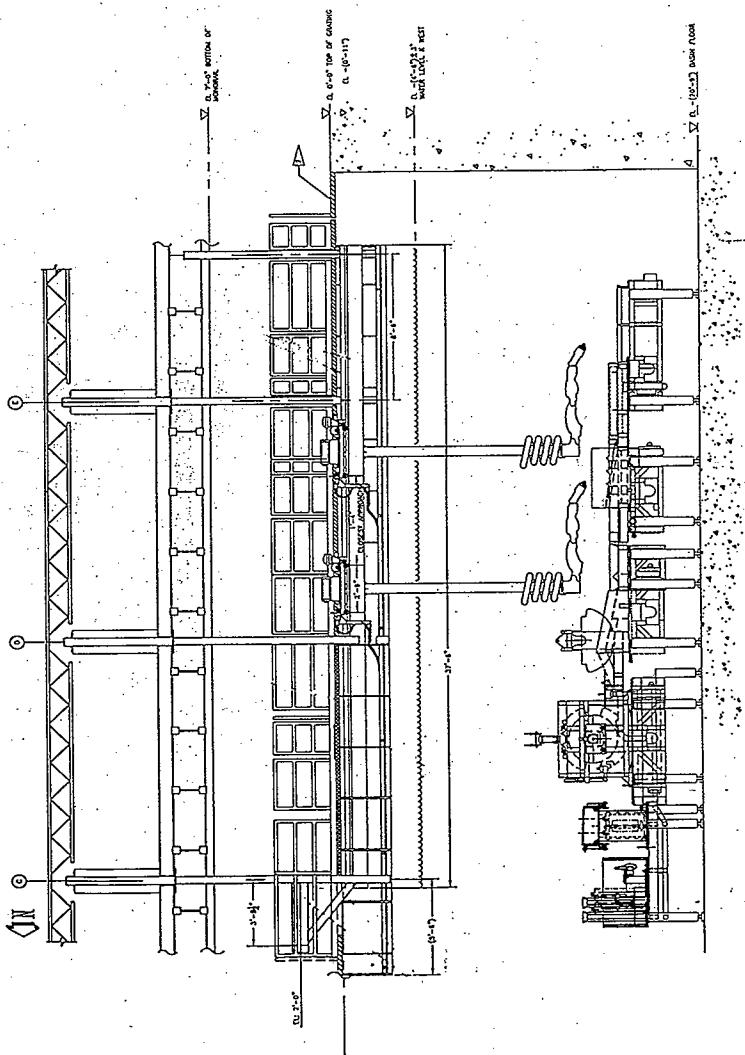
Fuel Retrieval System Equipment Section Elevation.
